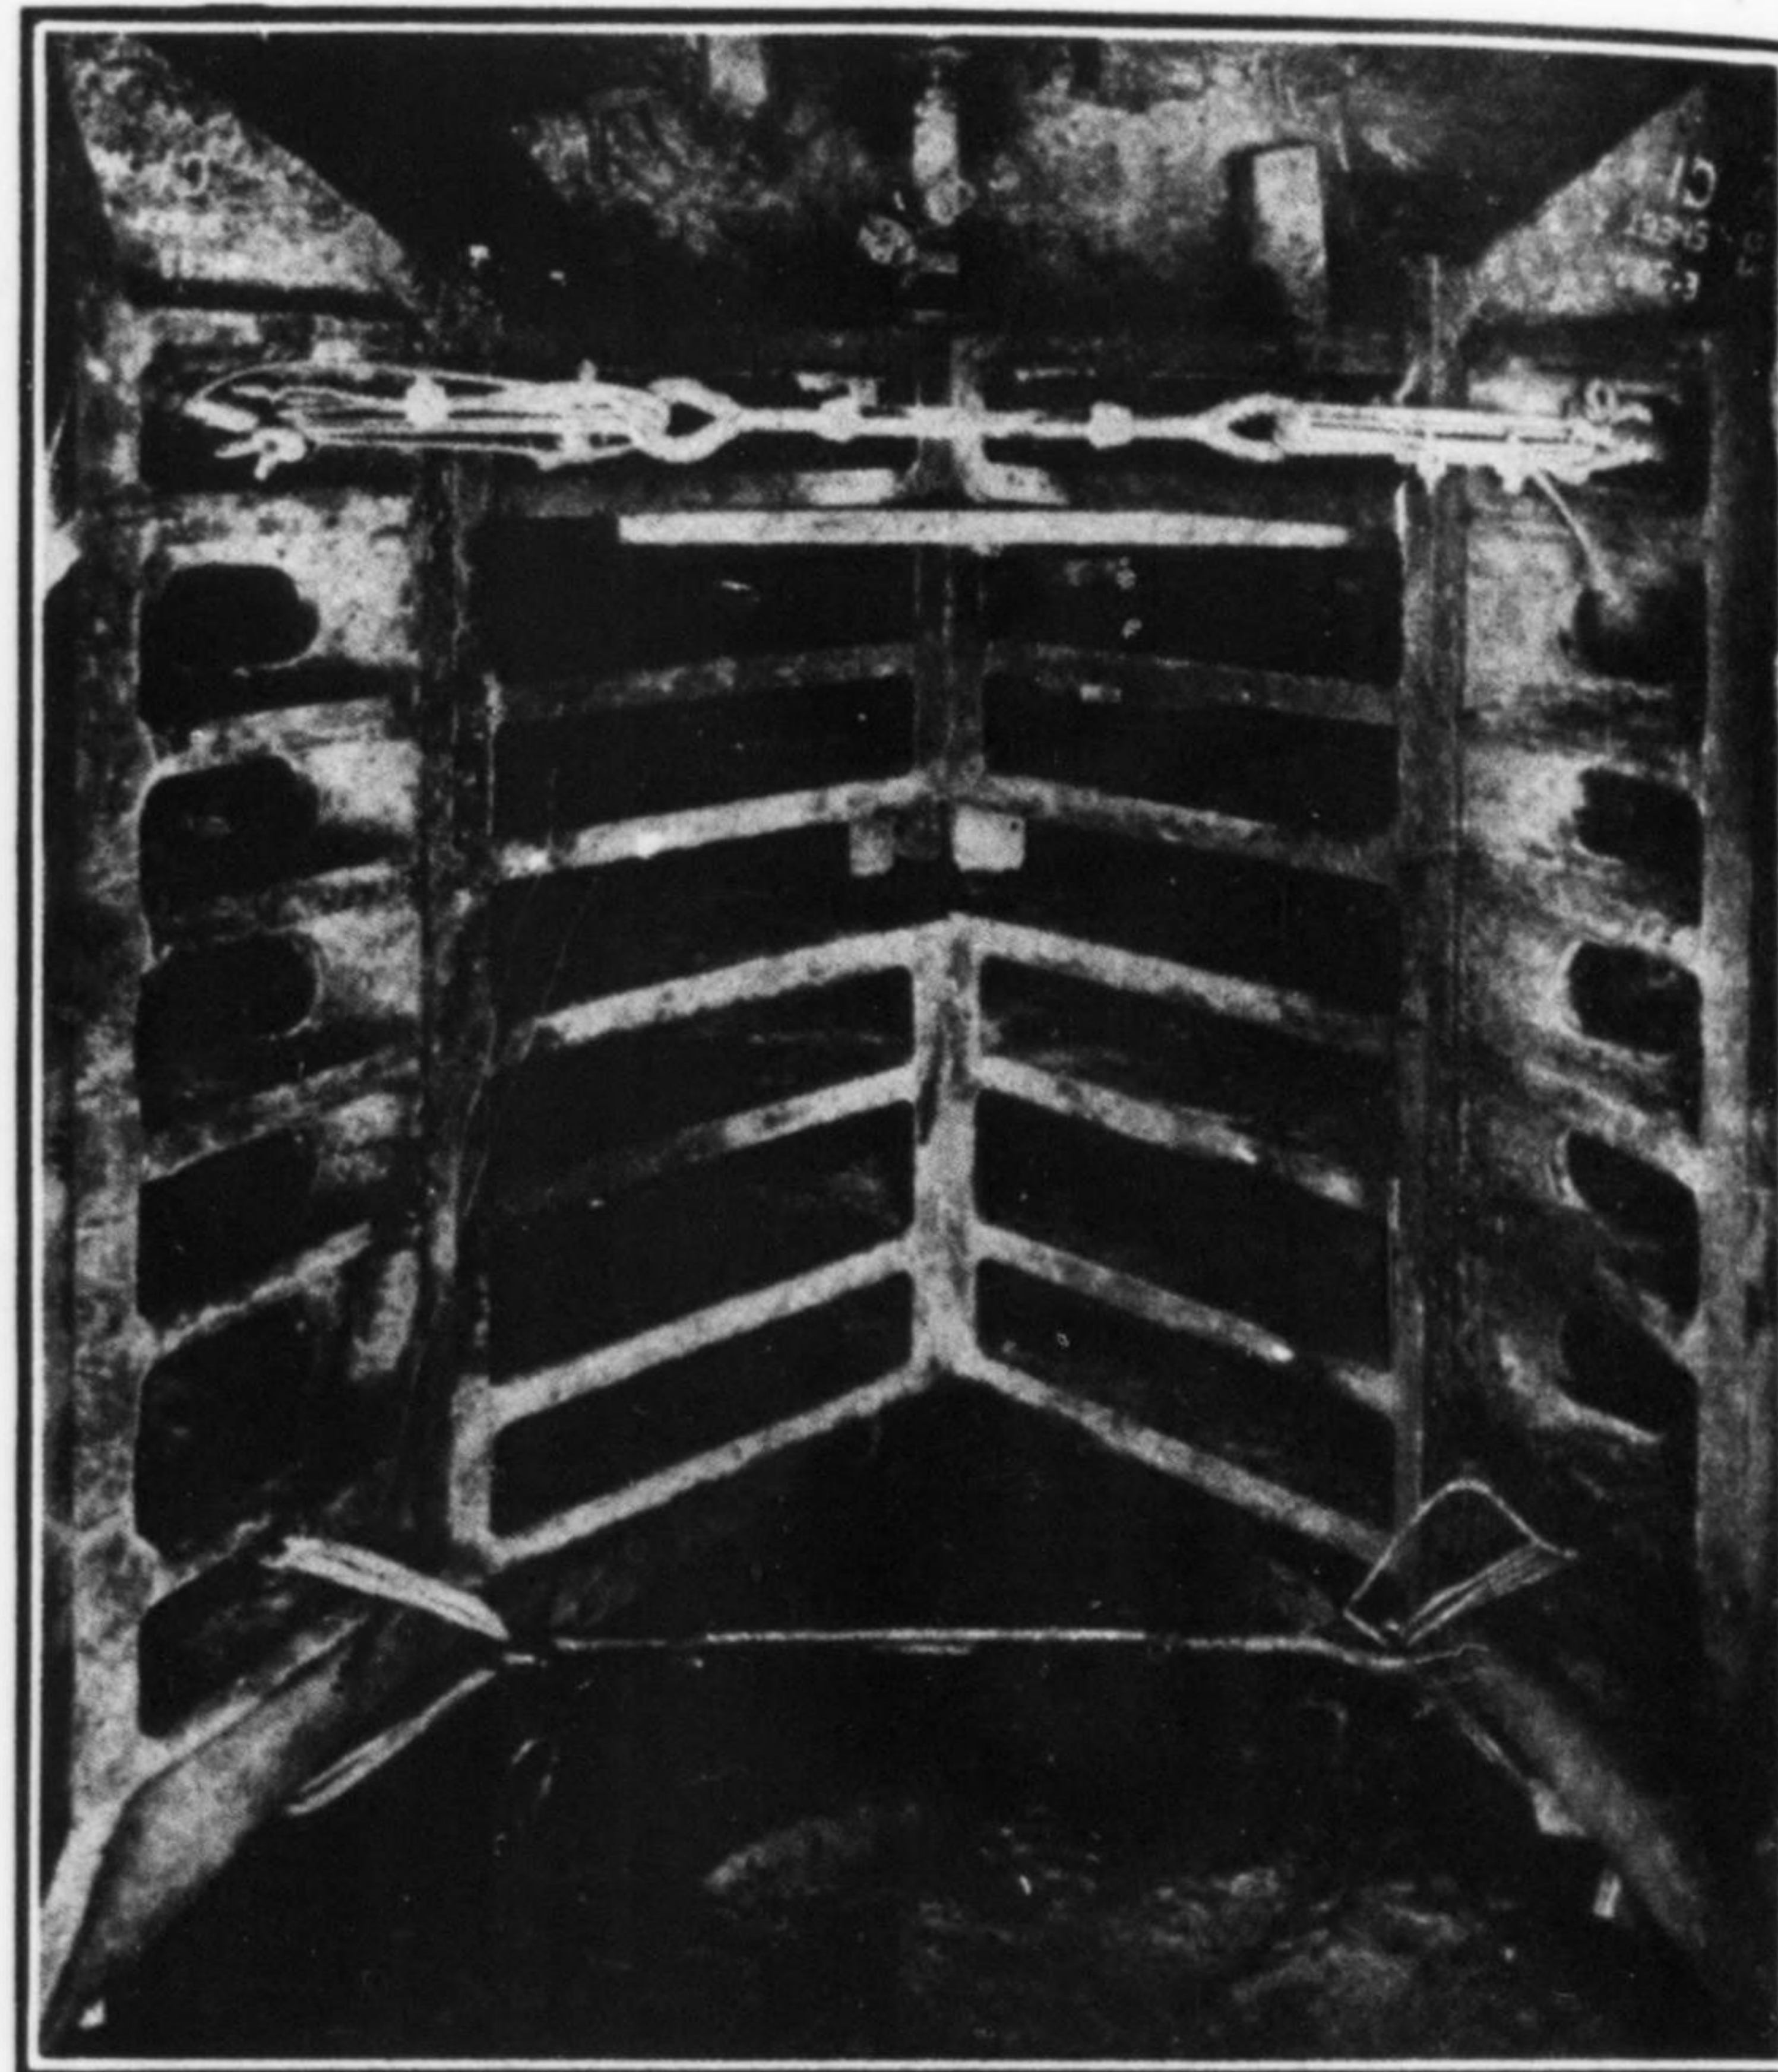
ANCHORAGE CASTINGS IN PLACE IN PIT Looking into inclined rock tunnel of north anchor chain on the west bank.
